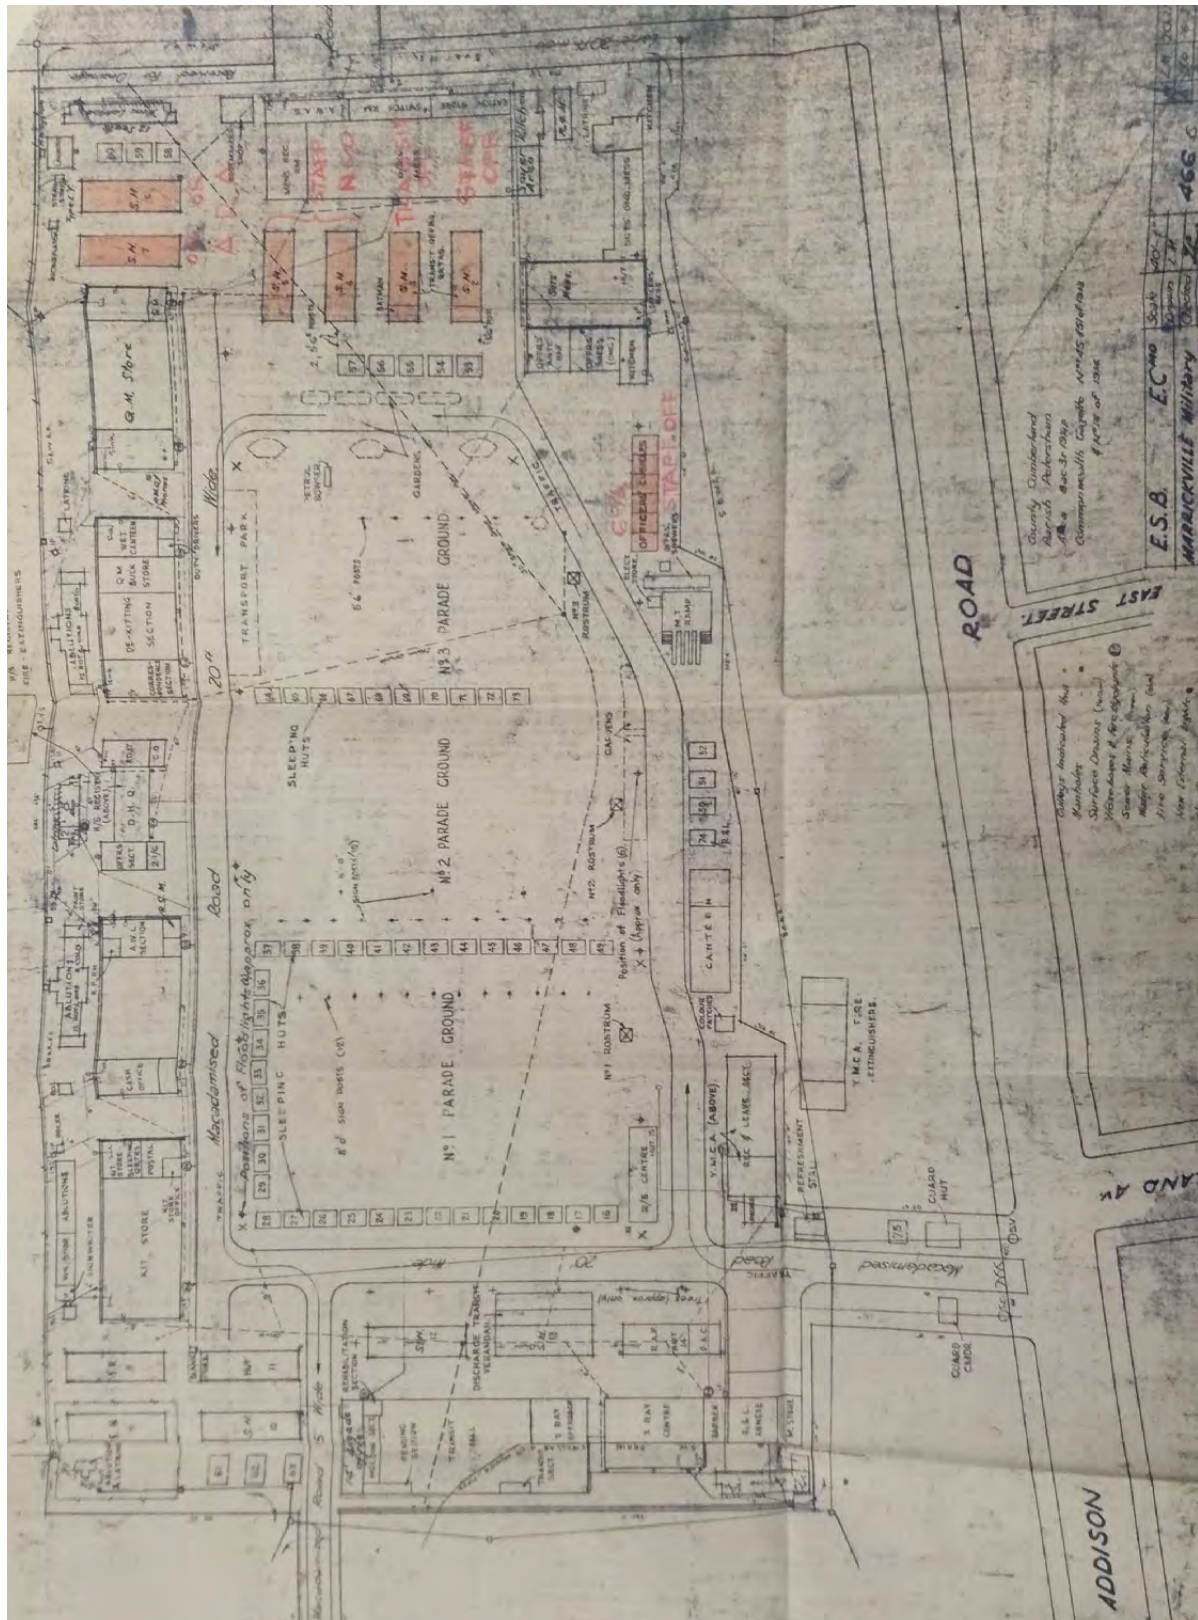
Site plan of the Leave & Transit Depot, showing buildings on the site by 1946, which have been added to a 1941 baseplan. 73 small sleeping huts have been grouped around the parade ground, which has been divided into three.
